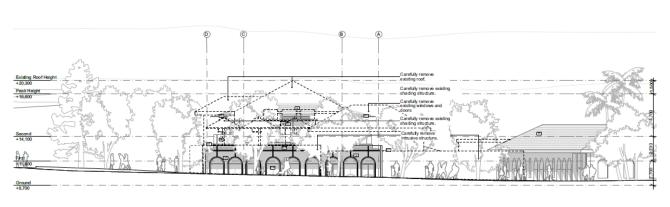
Existing north elevation – proposed demolition. Source: Lockhart-Krause Architects, 2021
